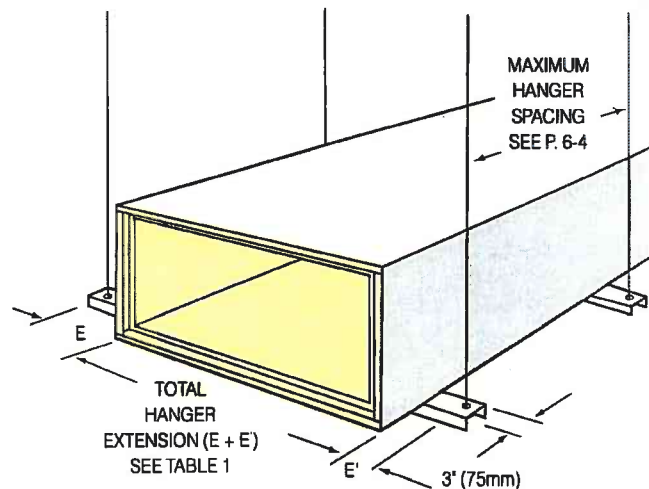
A. Hanger spacing and extension, 3" (75mm) wide channels.
